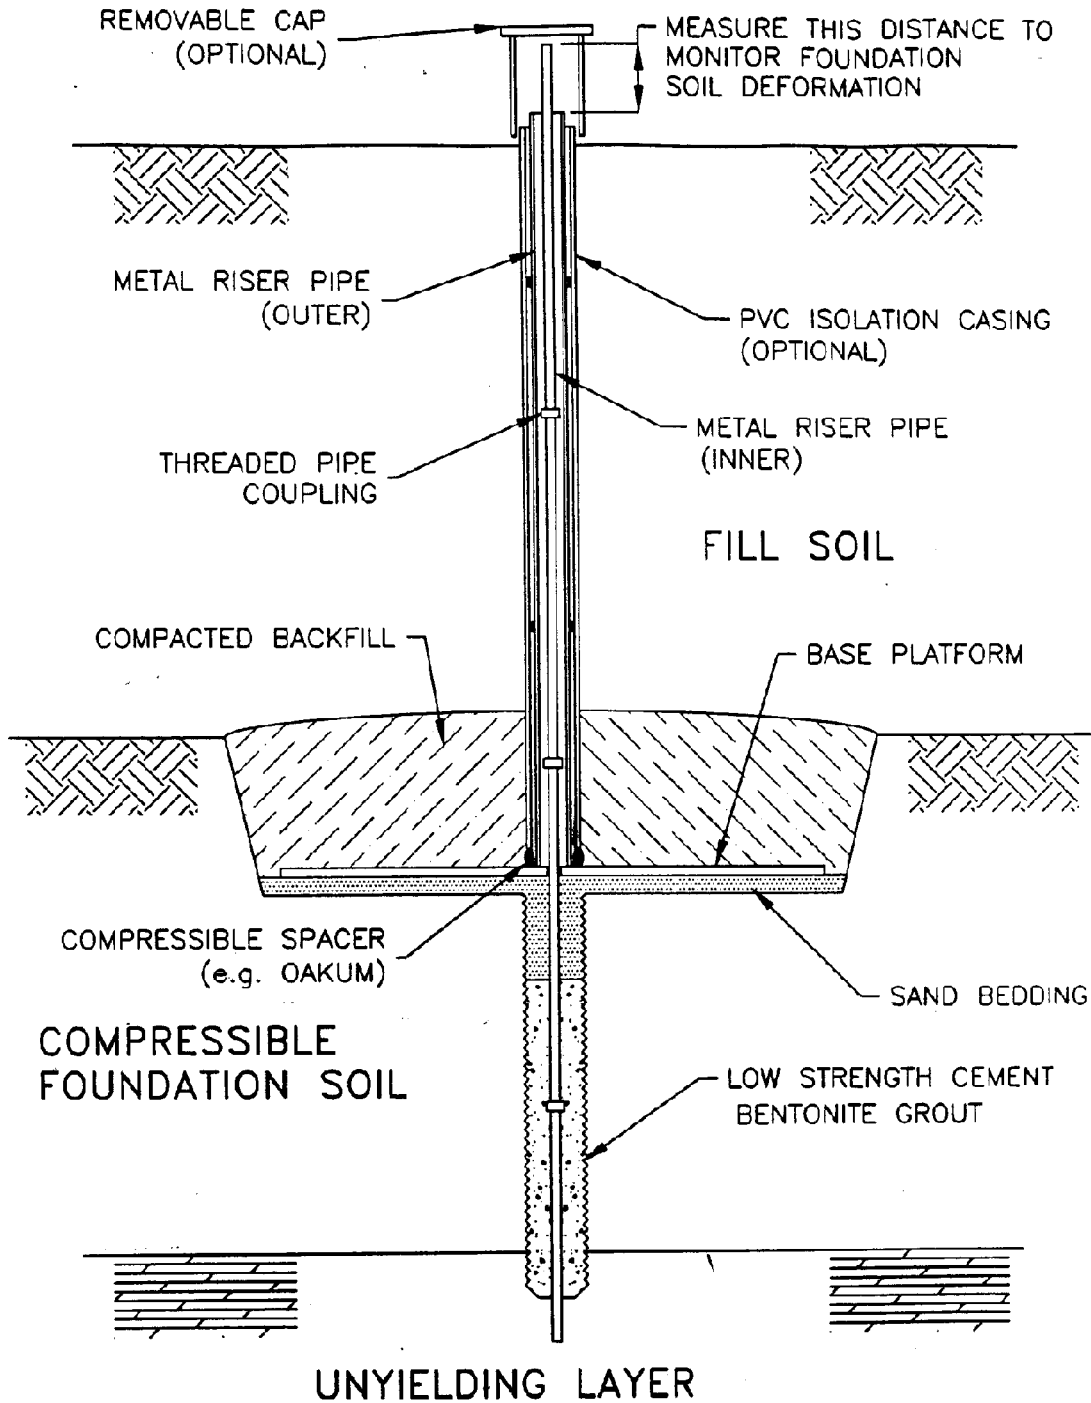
Typical Installation for Internally Referenced Settlement Platform with Grouted Pipe
